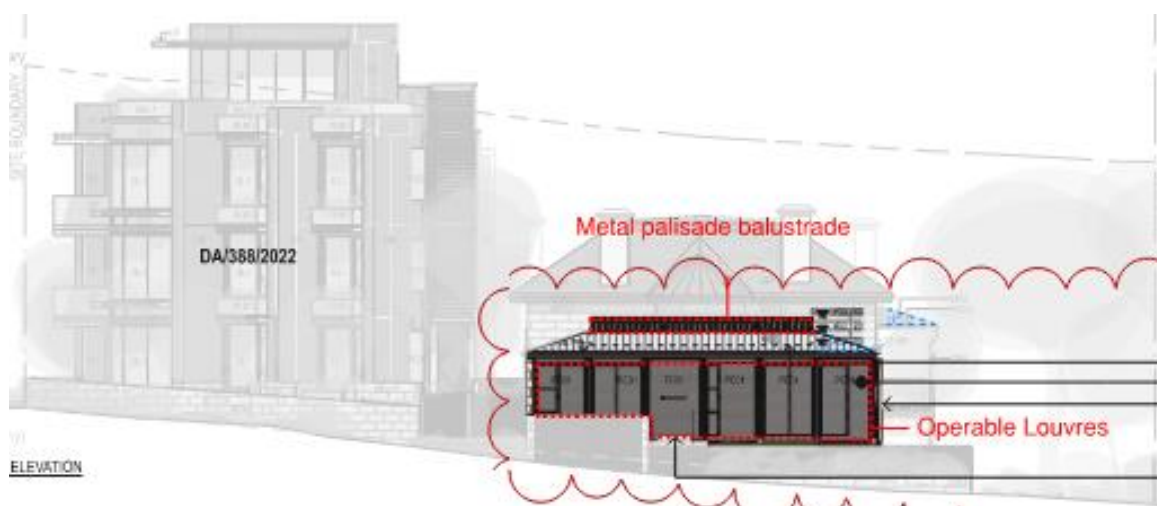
Image excerpt of northern elevation plan subject of peer review by external Heritage planning consultant and assessment of this application.
